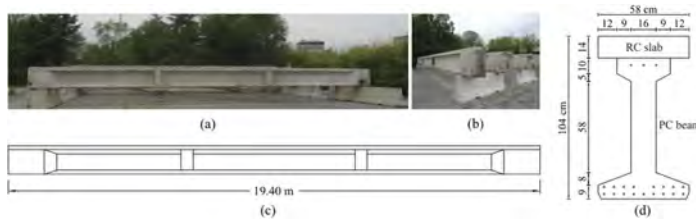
PC deck beams: (a-b) views, (c) longitudinal profile, and (d) cross-section at mid-span.
